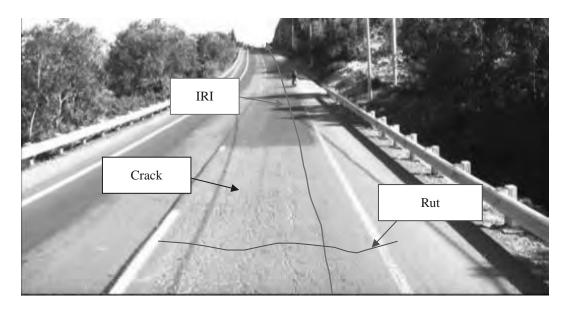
Pavement damage to be evaluated by PCS
